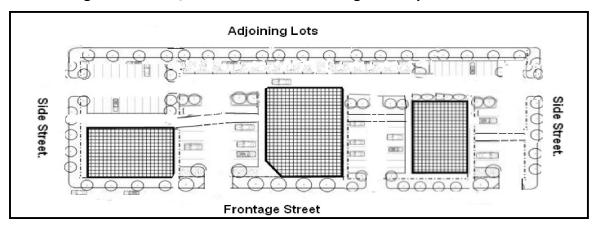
Retail/Office Center with Parking Lots Dispersed in Modules
